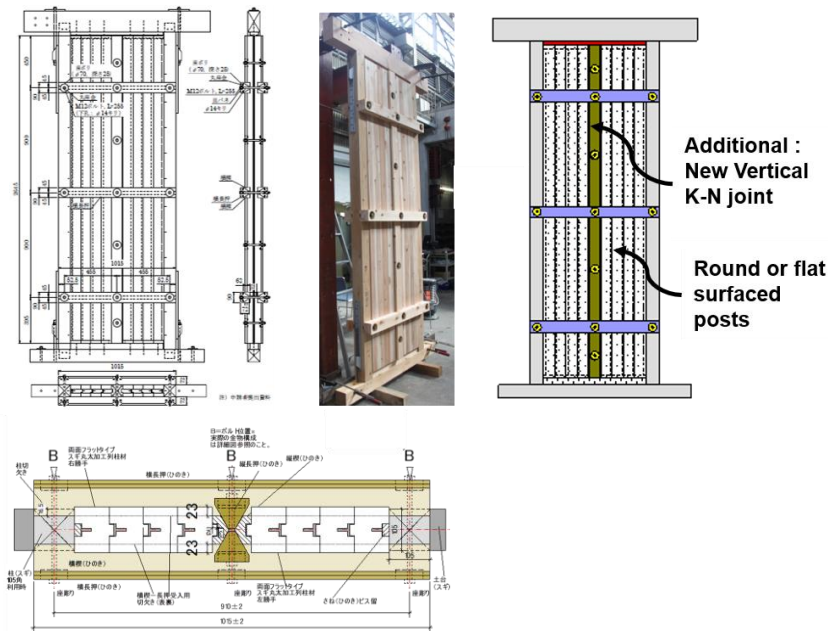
Drawings and photo of the New "Vertical" K-N joint added Sugi Shear wall.
